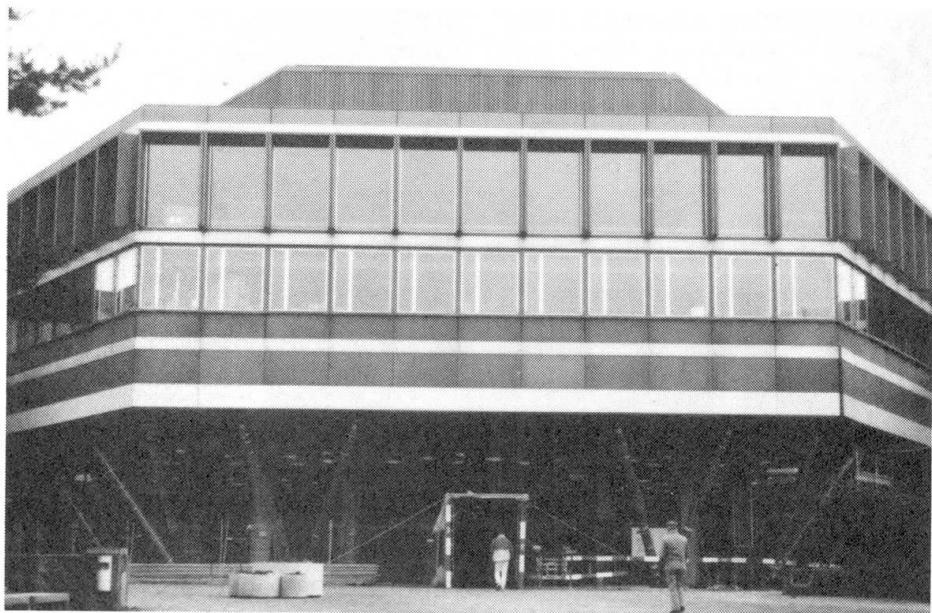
View from outside towards the upgraded building (during construction). The diagonal steel trusses are the main strengthening elements
